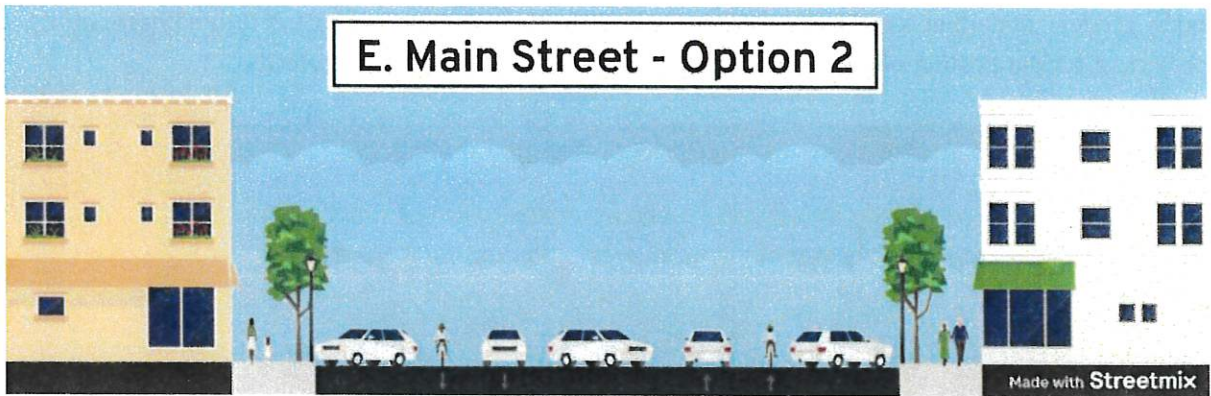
Downtown Streetscape Alternate Layout - Option 2
